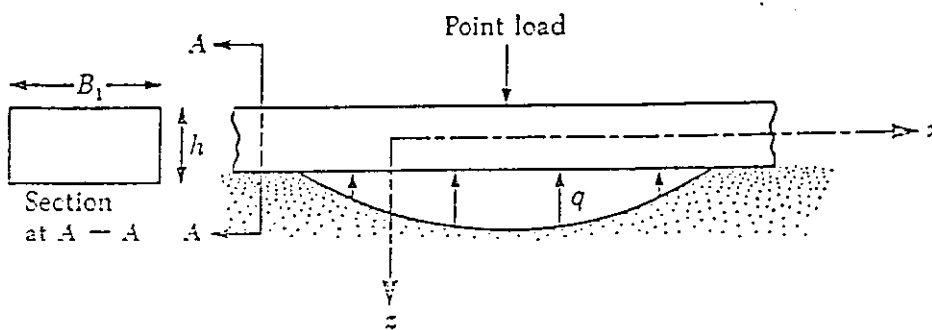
A beam on elastic foundation (after Das, 1990)
